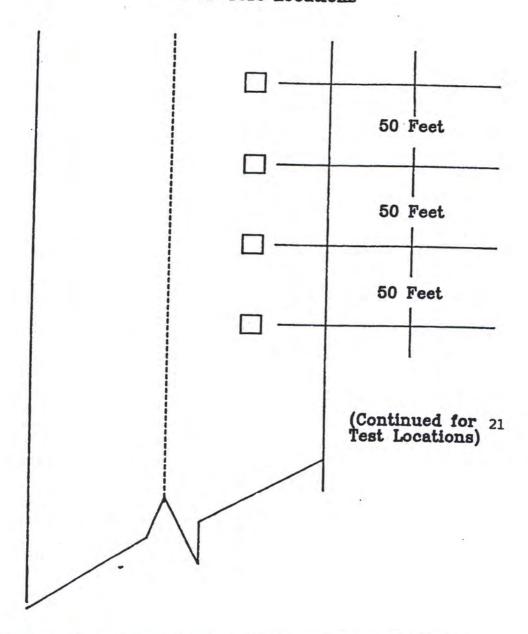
Spacing of Test Locations within Each Test Site (Total of 21 Test Locations/Site)
